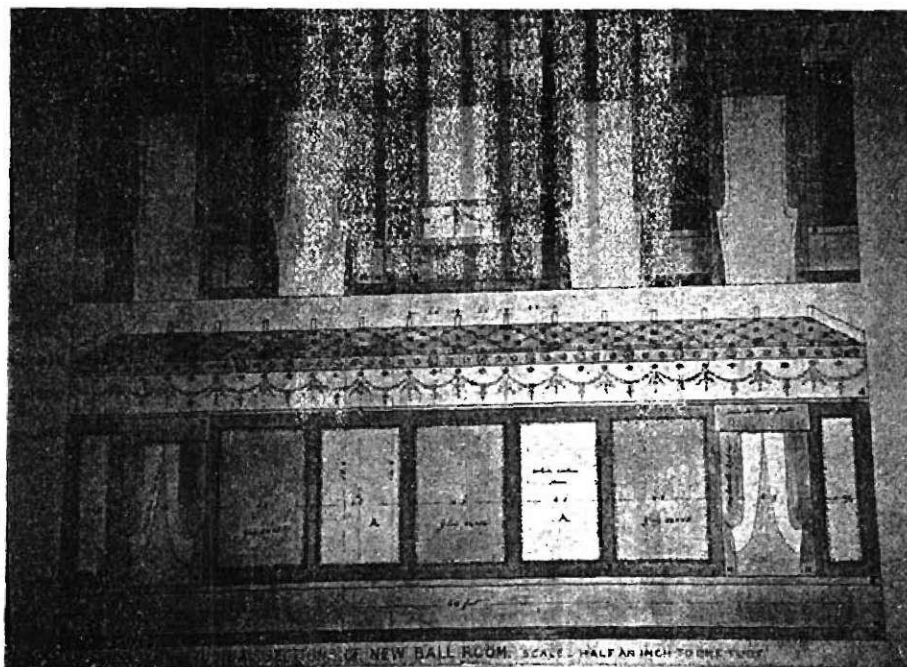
TOP Longitudinal section of New Ball Room, Eynsham Hall
